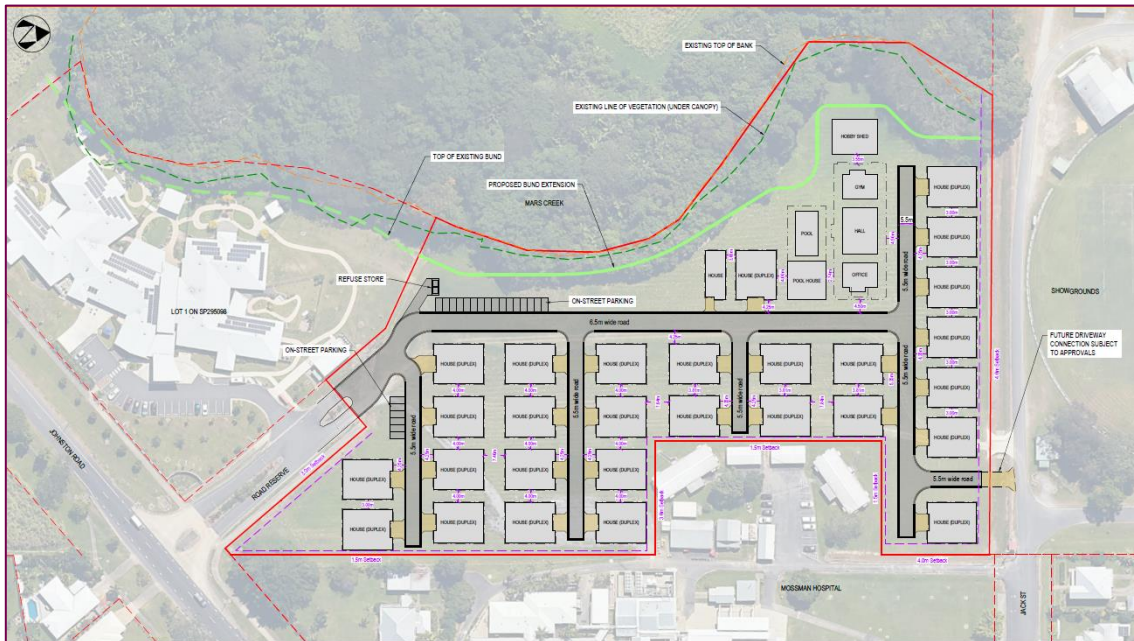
Site Layout Plan (Note Mossman Hospital to the East)
